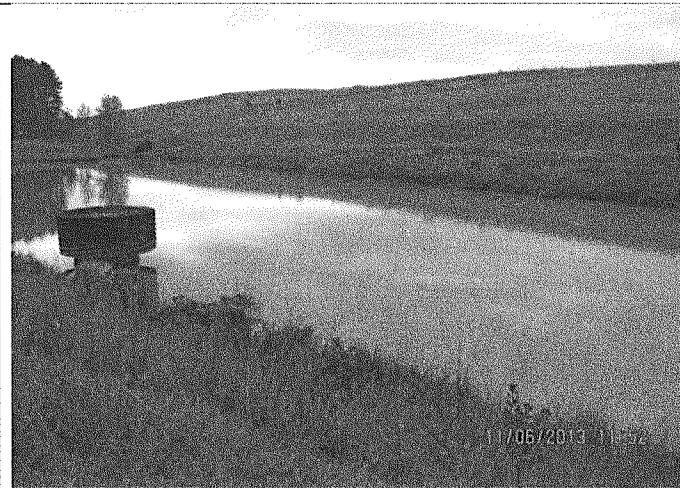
Sediment basin #2, to outfall 011 and south side of landfill.
